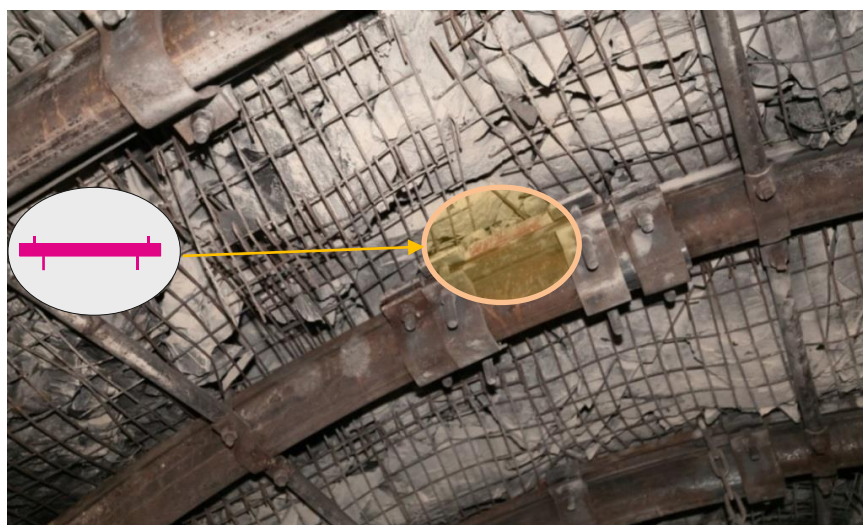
Load cell type Vibrating Wire installed on a steel plate on top of roof arch in maingate PW-1.
